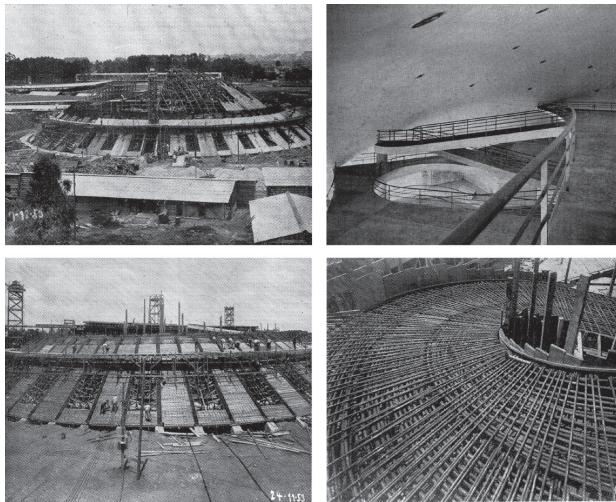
a) Concrete filling up to the level of the ring strap. b) OCA Interior with embedded light fixtures. c) Concrete filling to form the alternate slabs with respect to the window positions. d) Ramp rebar. Source: Acrópole Magazine, n. 191, 1954, p. 496 e 497 / Figura 4. a) Interior del Oca con las lámparas empotradas. b) Vaciado del hormigón del Oca, hasta el nivel del cinturón c) Fundición de las losas alternadas en relación a las posiciones de las ventanas. d) Armado de la rampa. Fuente: Revista Acrópole, n. 191, 1954, p. 496 e 497.
